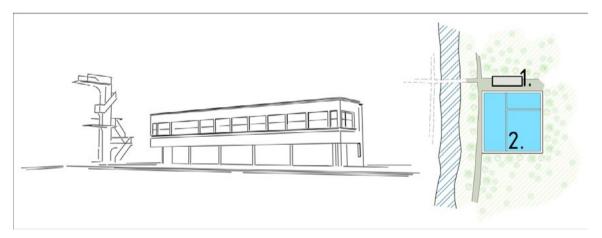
Situation plan and architecture scheme of swimming pool in Wisła, 1. Main building, 2. swimming pool.
